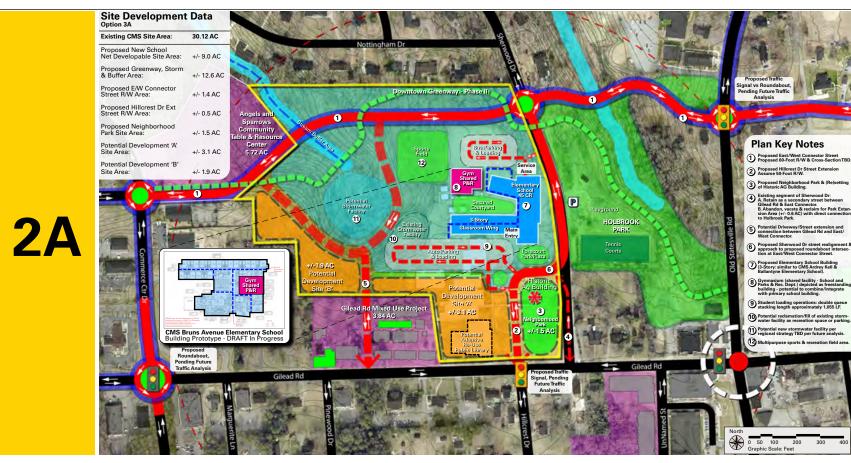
Potential Future CMS Huntersville Elementary School: Conceptual Site Plan: Scenario 2A.
